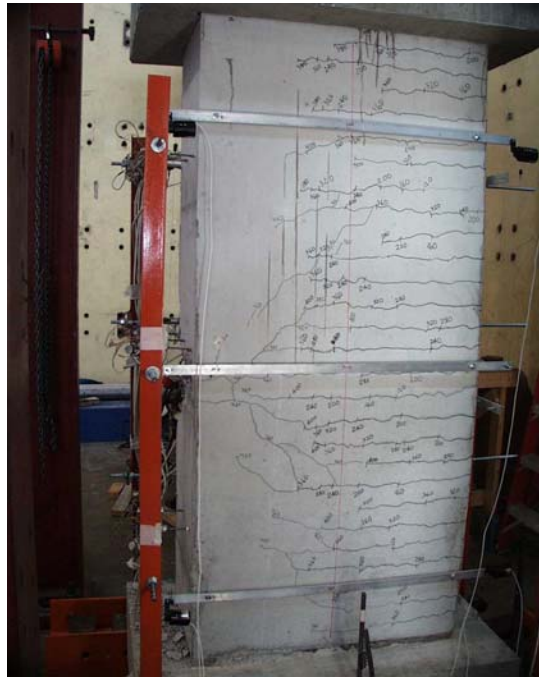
Specimen P8: Photo of West Wall at End of Test
